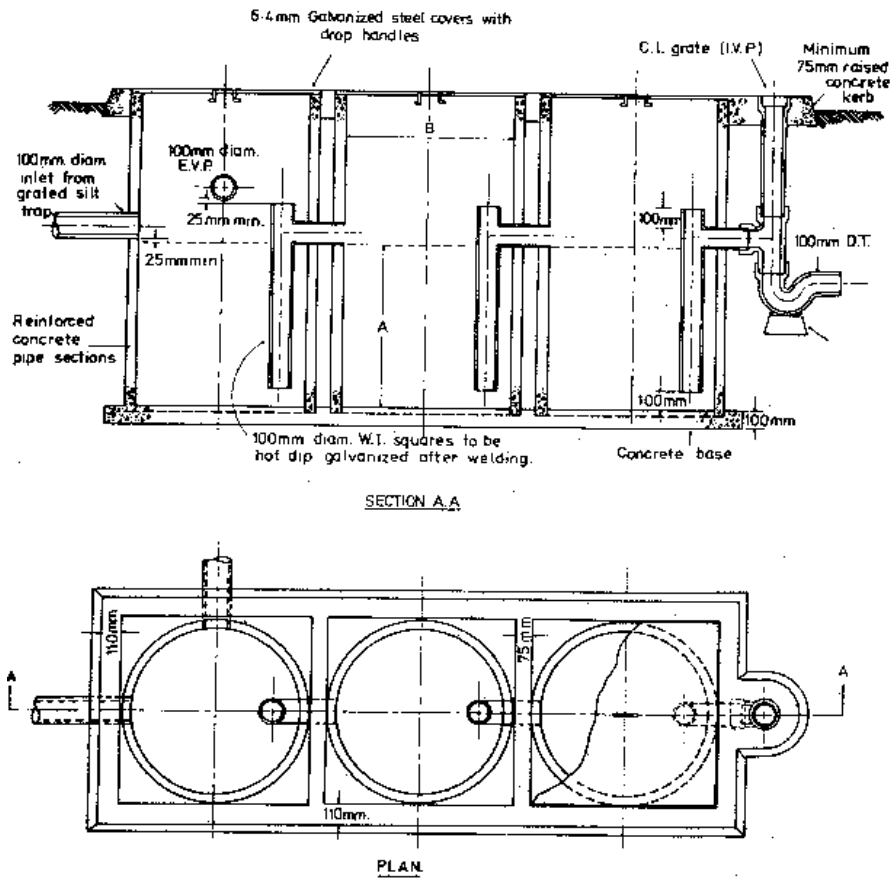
PREFABRICATED GREASE TRAP CONSTRUCTION
